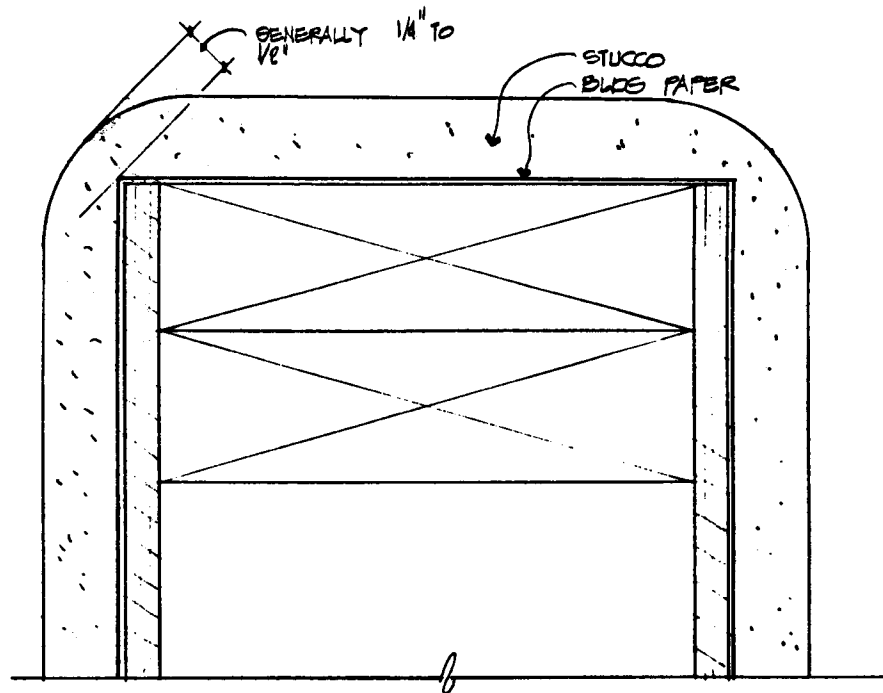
Parapet cap as built leading to water infiltration when stucco cracked at corners.
